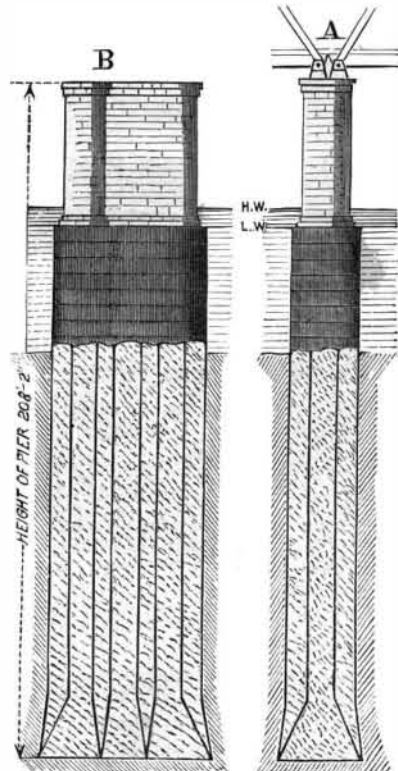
SECTIONAL ELEVATION OF PIER.
